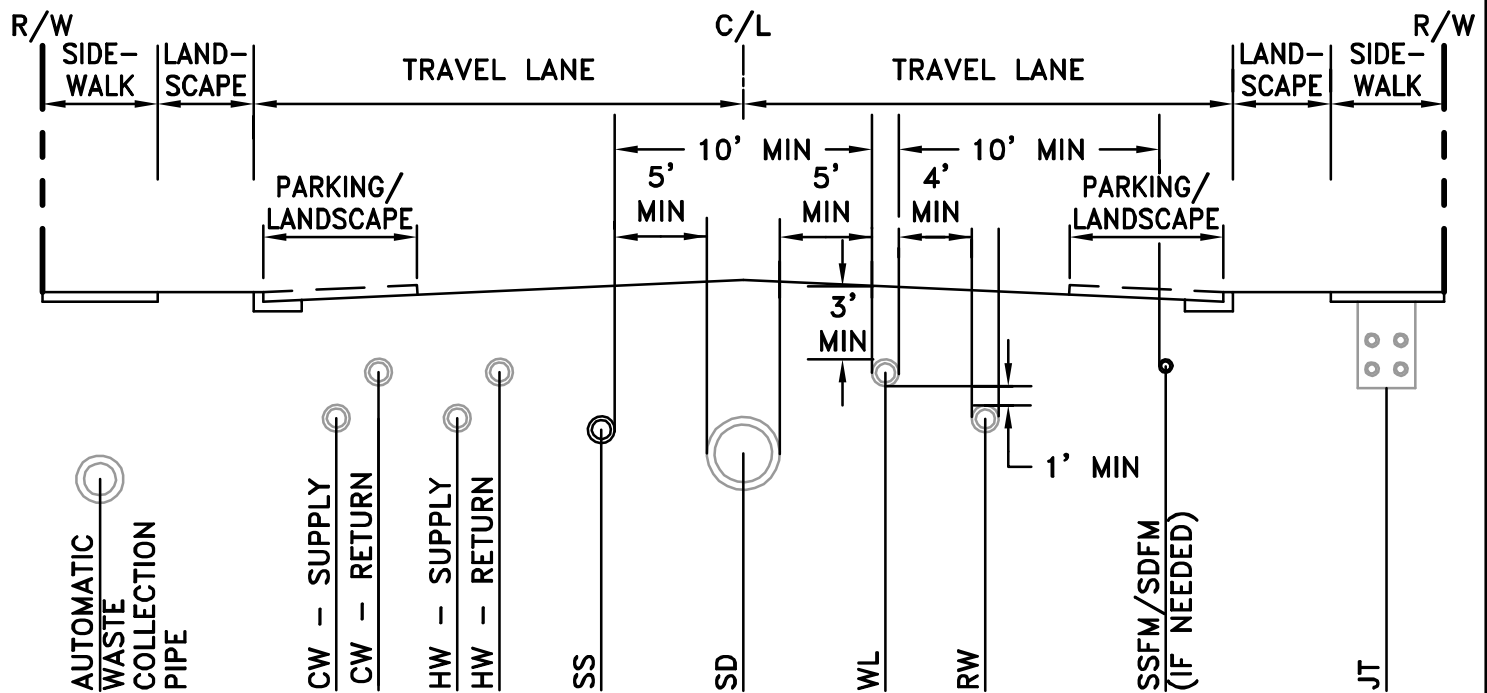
Detail of Wastewater Collection System in Streets
